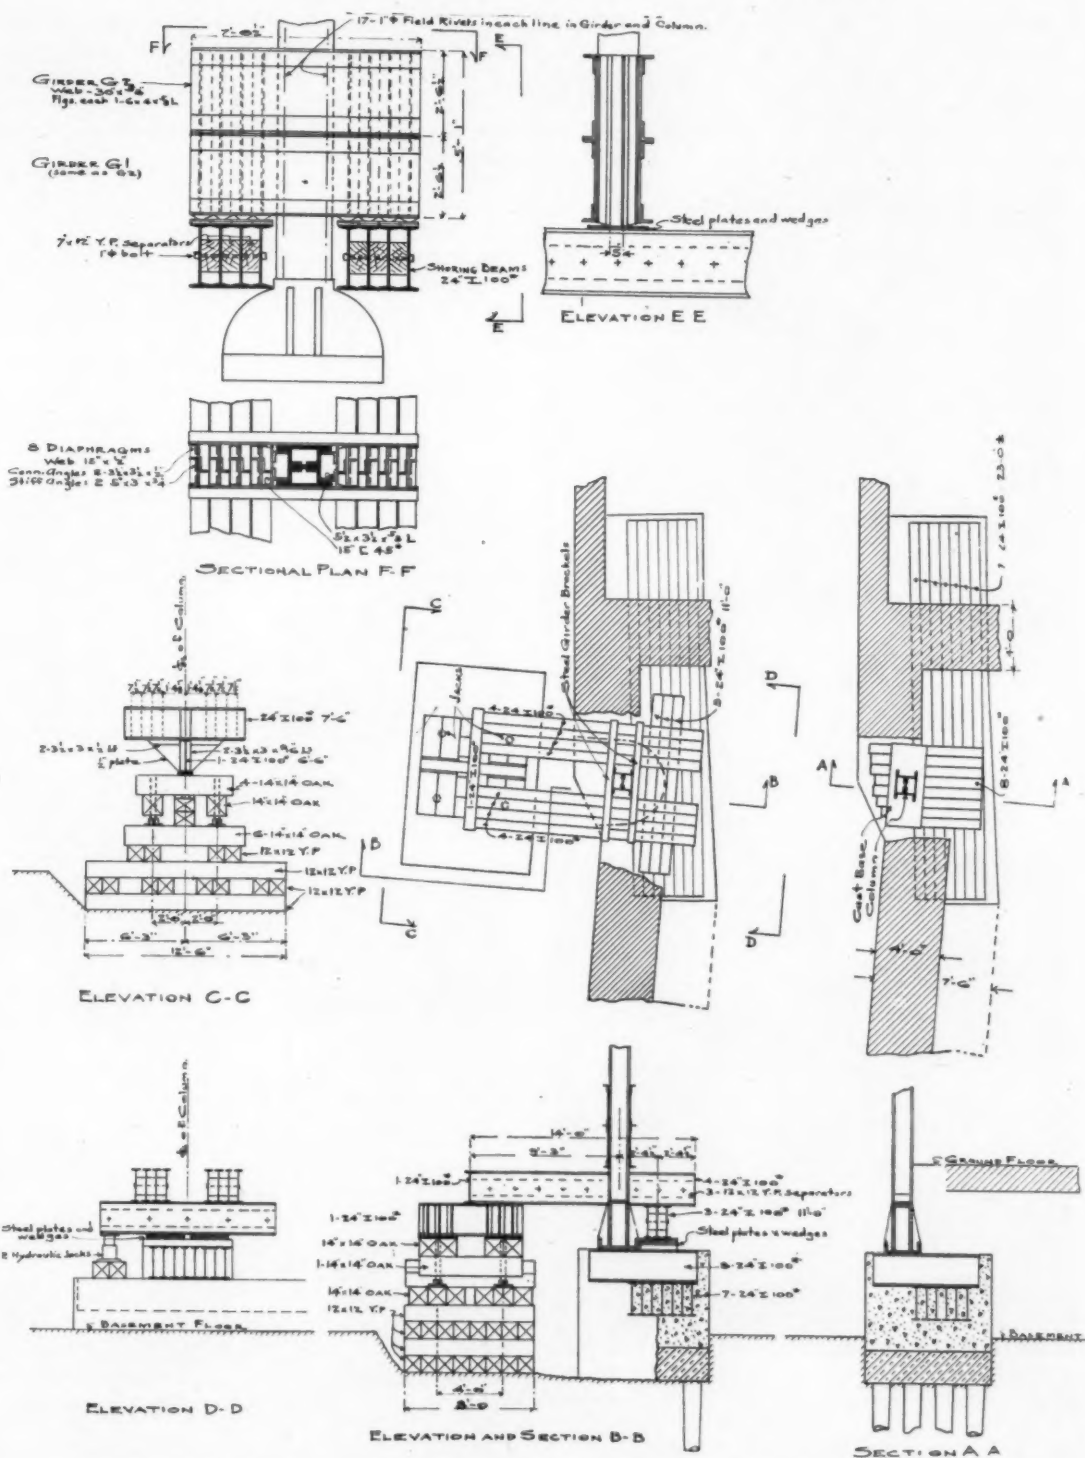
Details of shoring of Column H in south wall of the old Standard Oil Building, No. 26 Broadway
